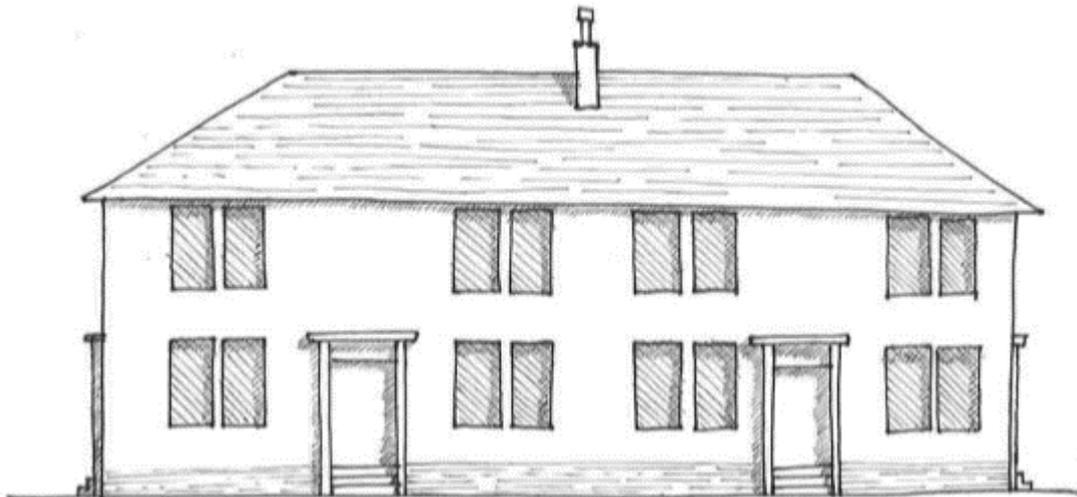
A typical four-in-a-block cottage as found in Piersland Park Conservation Area, with rectangular plan and hipped roof (EAC DP&R).
